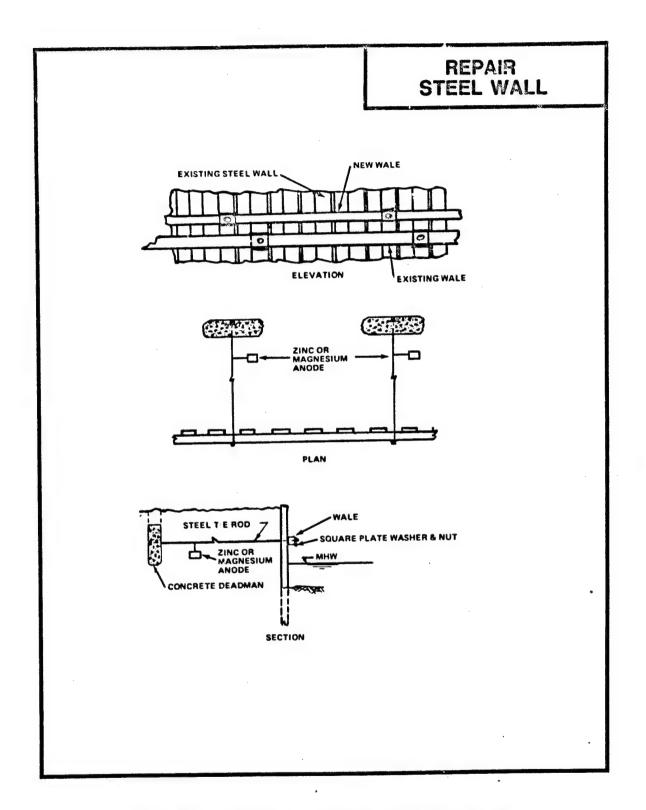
Installing or Replacing Tie-Back Systems for Steel Sheet Pile Wall.
